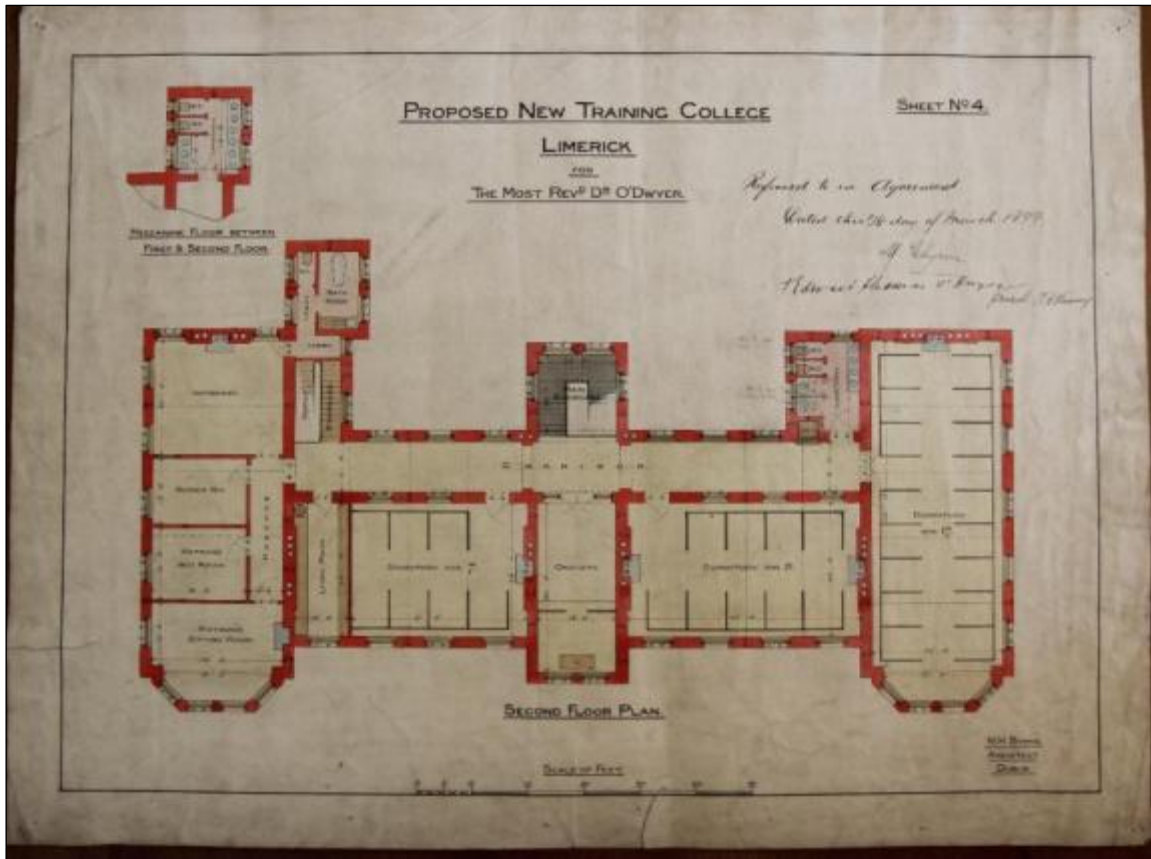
Mary Immaculate College Second Floor Plan - Irish Architectural Archive
